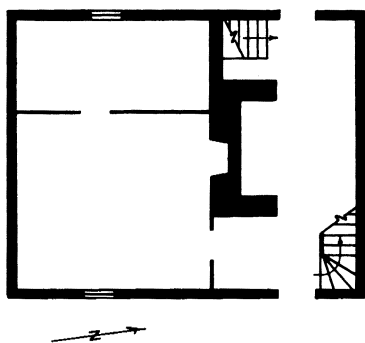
Andrew Keyser House. Restored first-floor plan.
